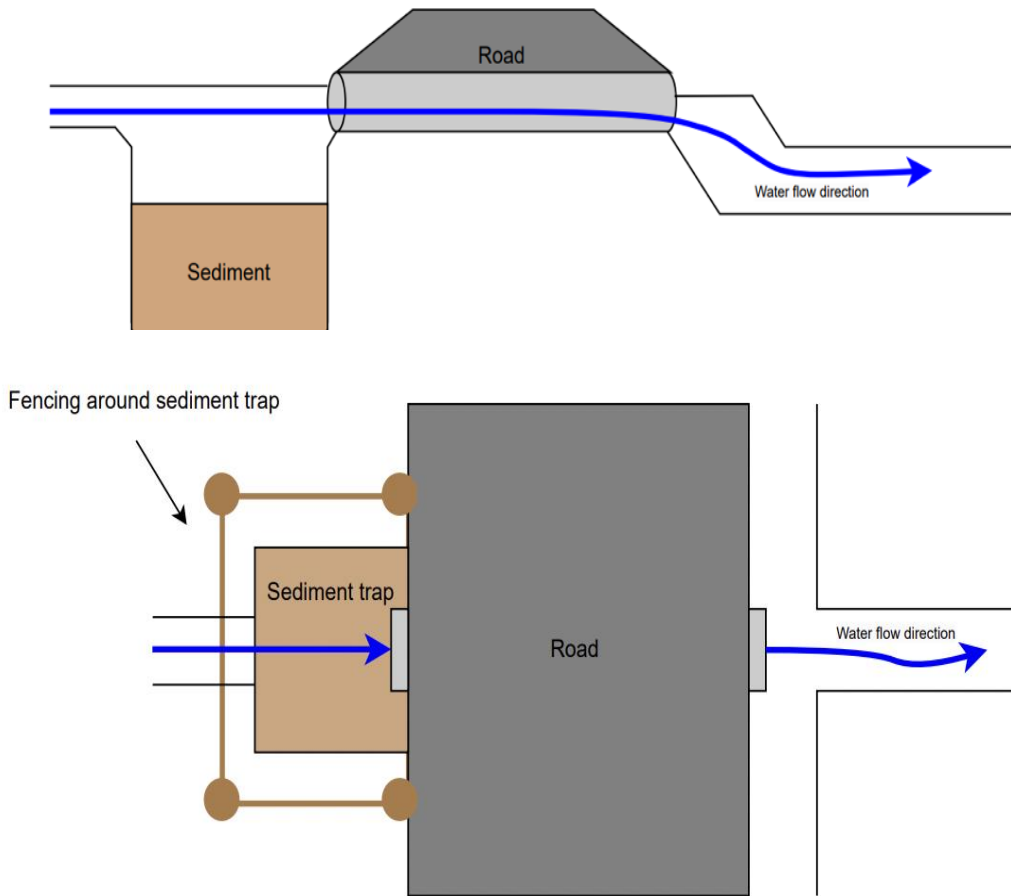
Design for possible sediment trap solution. Cross section and plan view.
